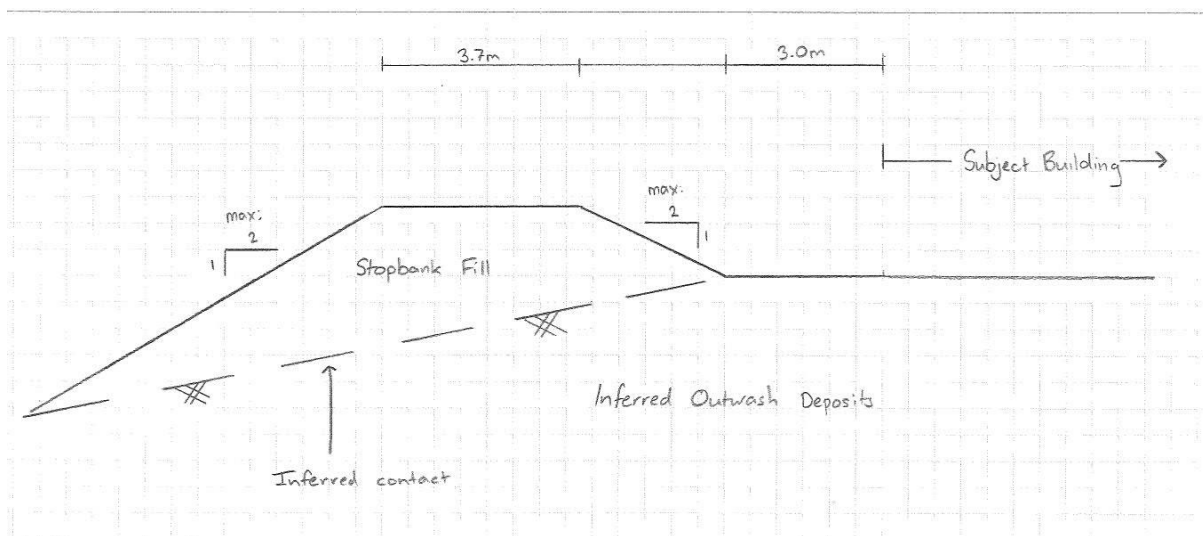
Cross section sketch through the stopbank at the closest location to the subject building. The ground model has been inferred from site observations and surrounding site investigation data.
